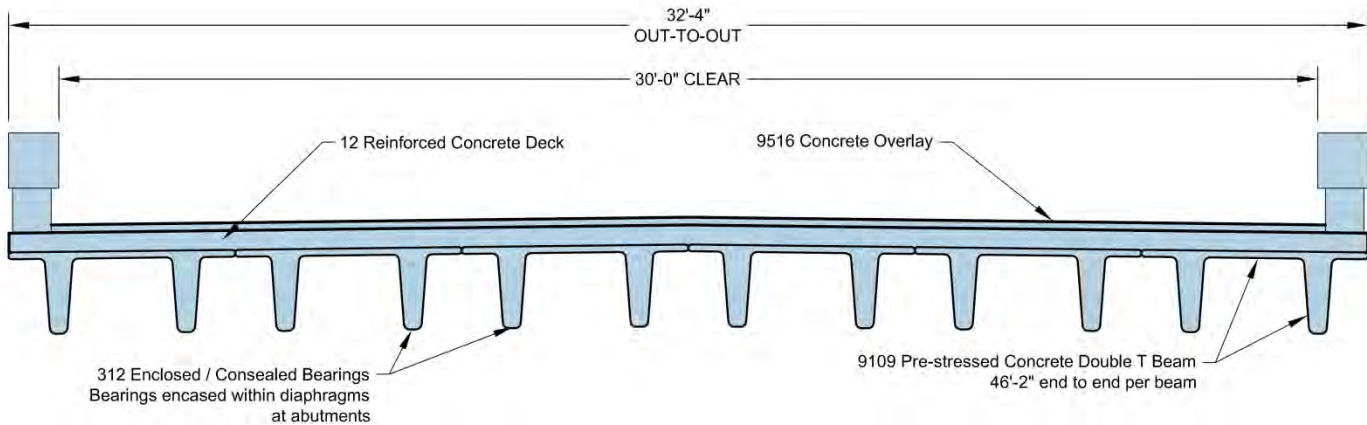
EI.24.6- 2: Plan view of prestressed concrete double T Beam bridge
